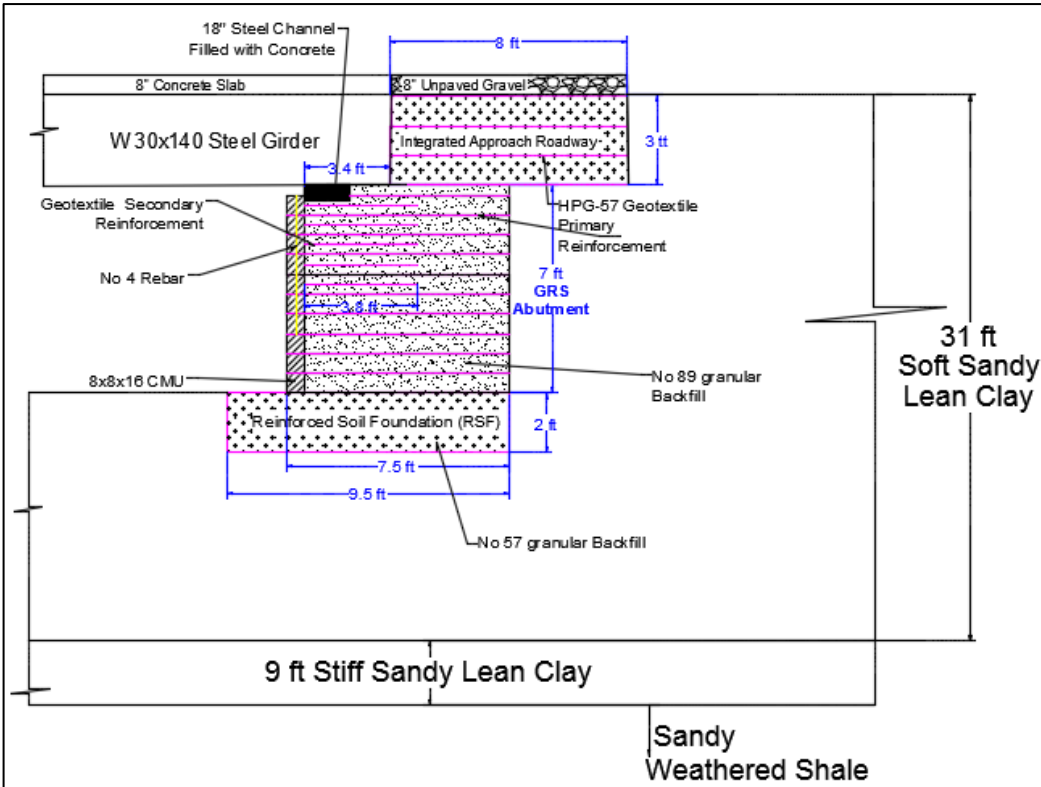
Detailed as-built cross-section of the GRS-IBS Bridge No. 2 in Kay County (Ngo 2016)
